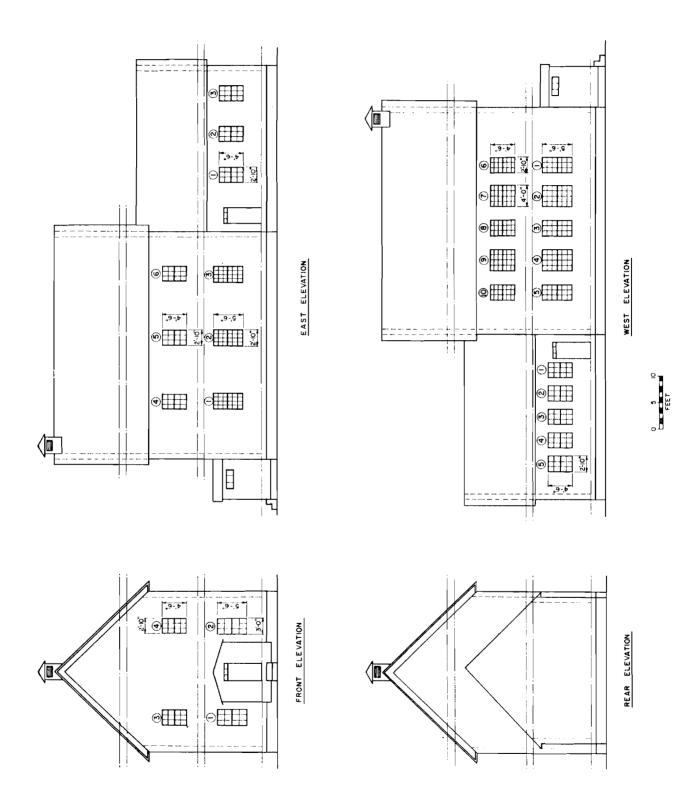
BUILDING No. 8 - TWO - STOREY SOLID BRICK
